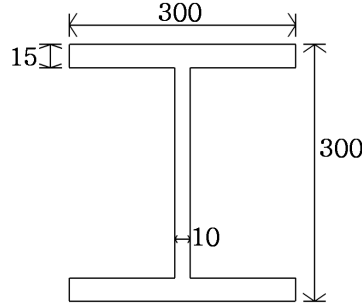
H-300 × 300 × 10 × 15 section (unit: mm)
